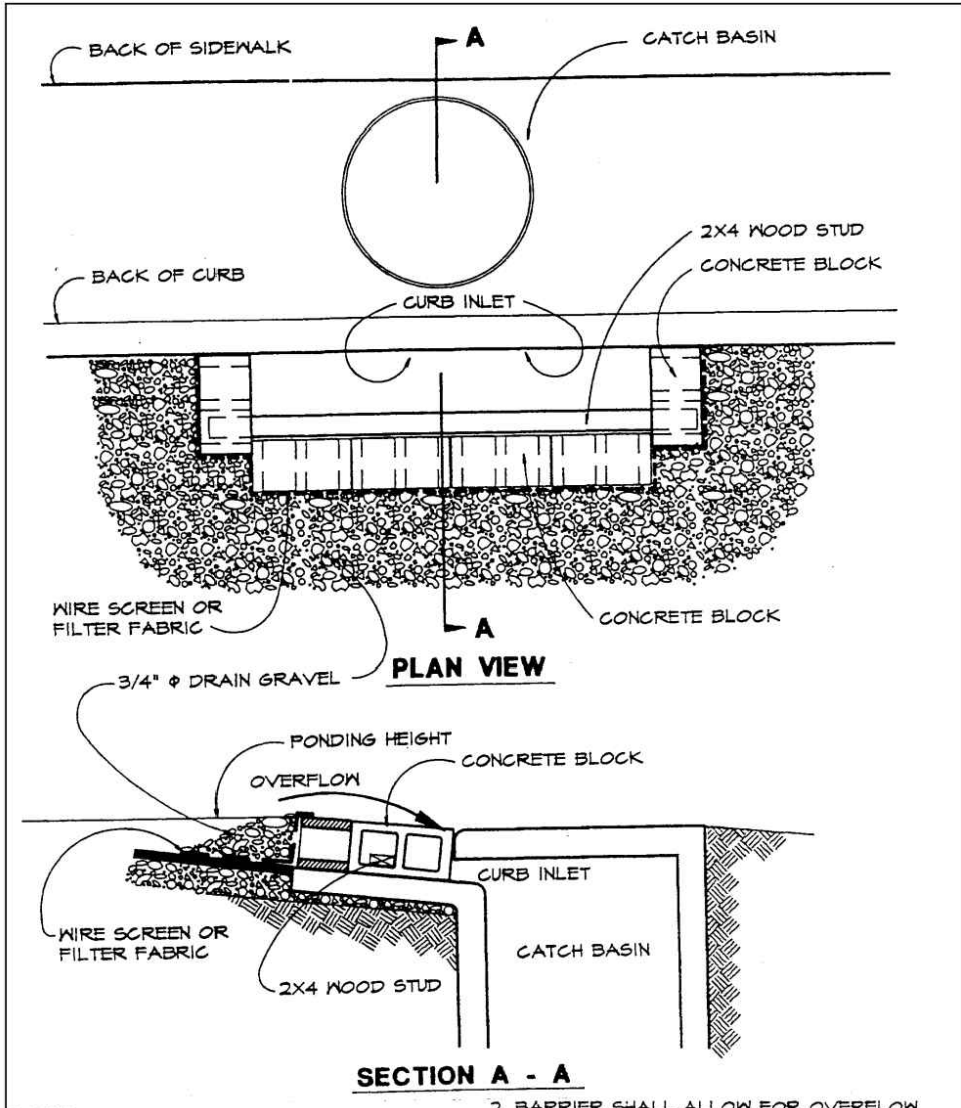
Block and Gravel Curb Inlet Sediment Barrier
